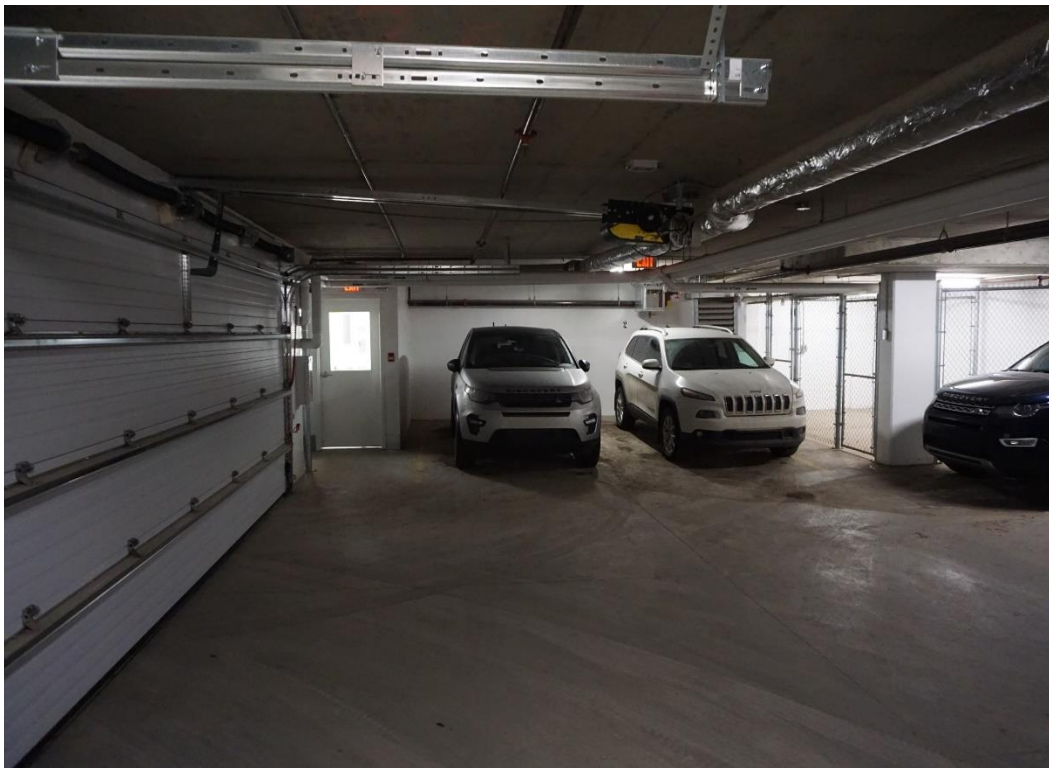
Interior view of the parkade overhead door and door opener mounted on the ceiling.
